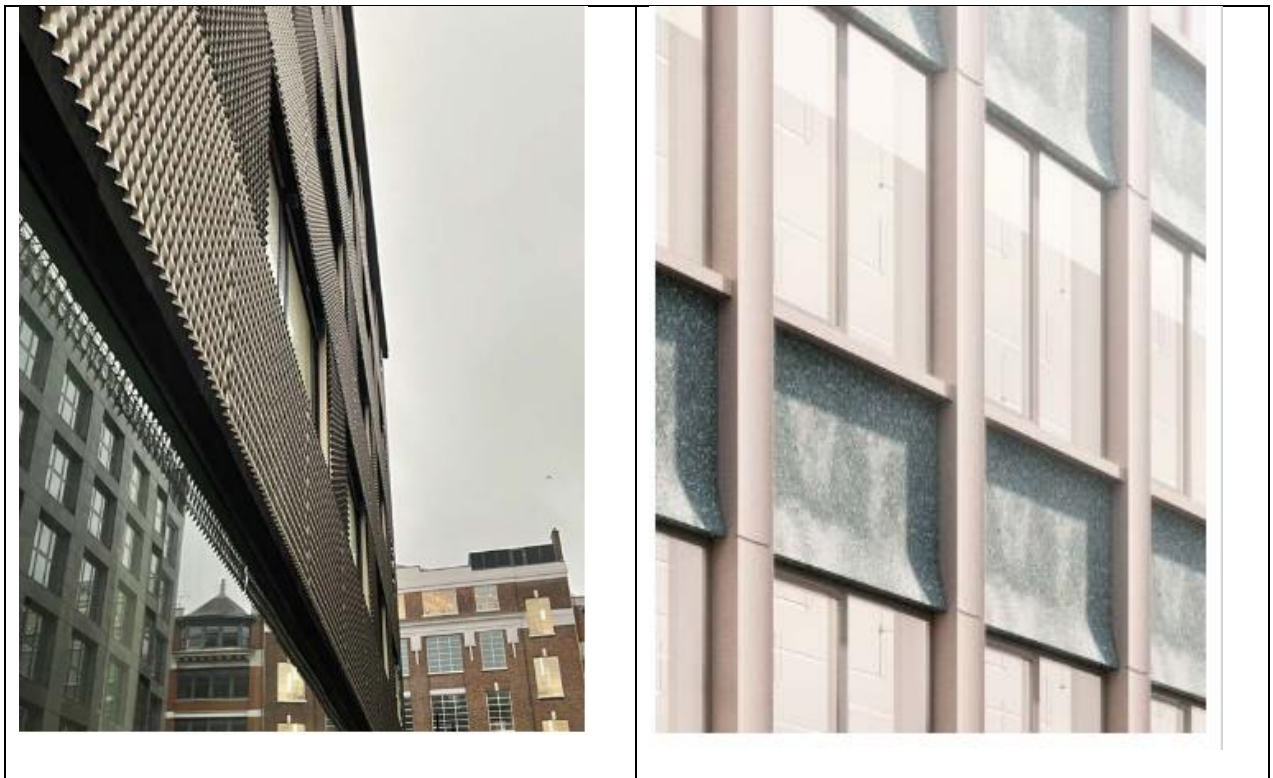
Existing Great Sutton Street mesh removed to expose existing terrazzo
